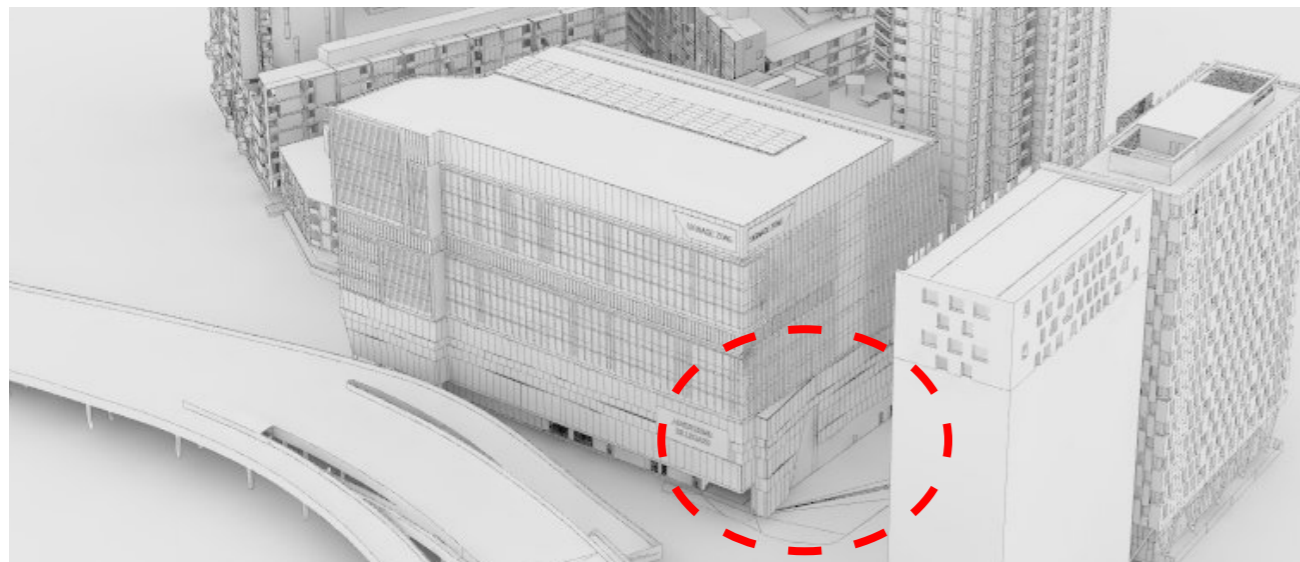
Section 96 NW Plot, indicating the north west corner condition along Darling Drive
